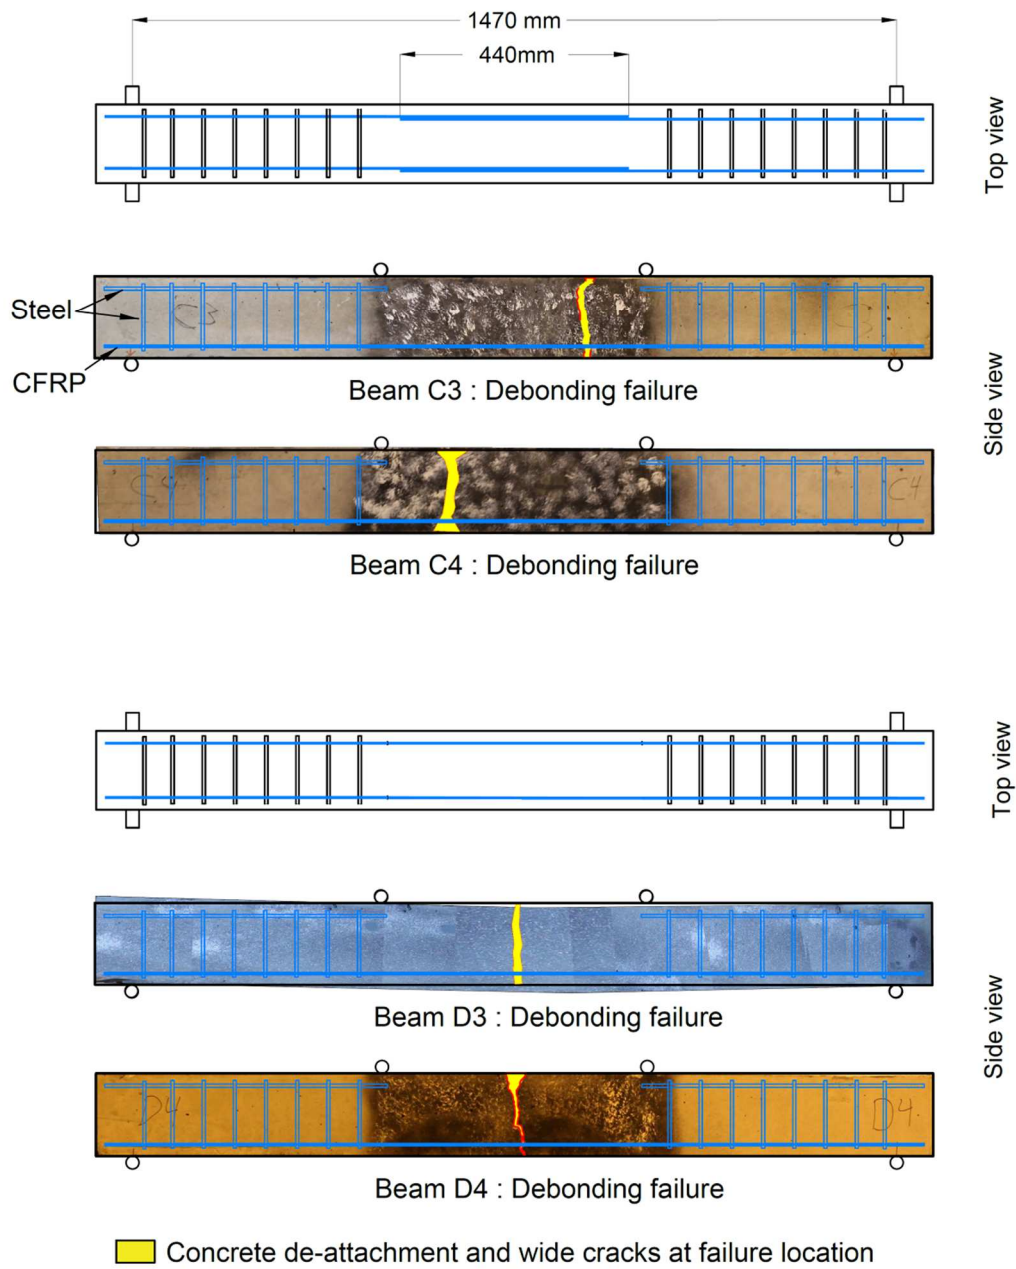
Failure zones and mechanisms for beam specimens with splice and continuous CFRP bars at elevated temperatures.
